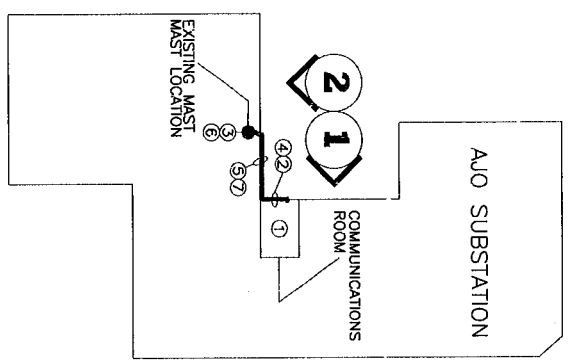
EXHIBIT C EXTERIOR INSTALLATION DRAWING
